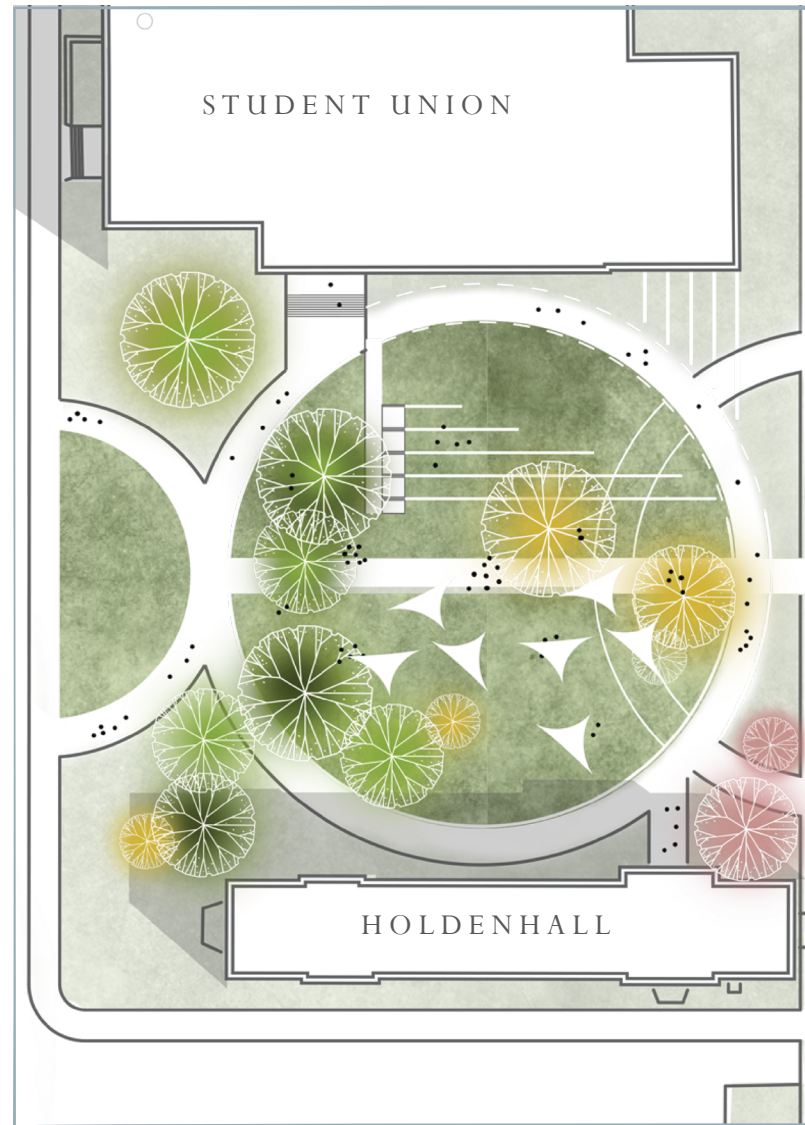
Enlarged Site Plan of Kassab Mall Proposal.
